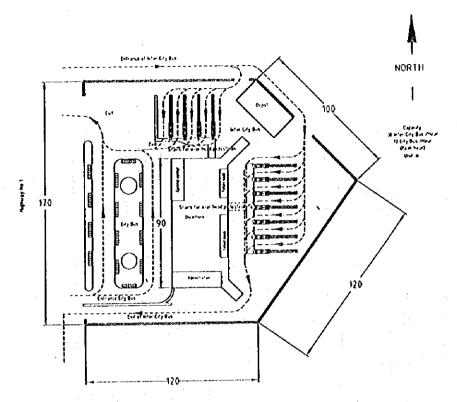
Plan of Giap Bat Terminal Improvement
